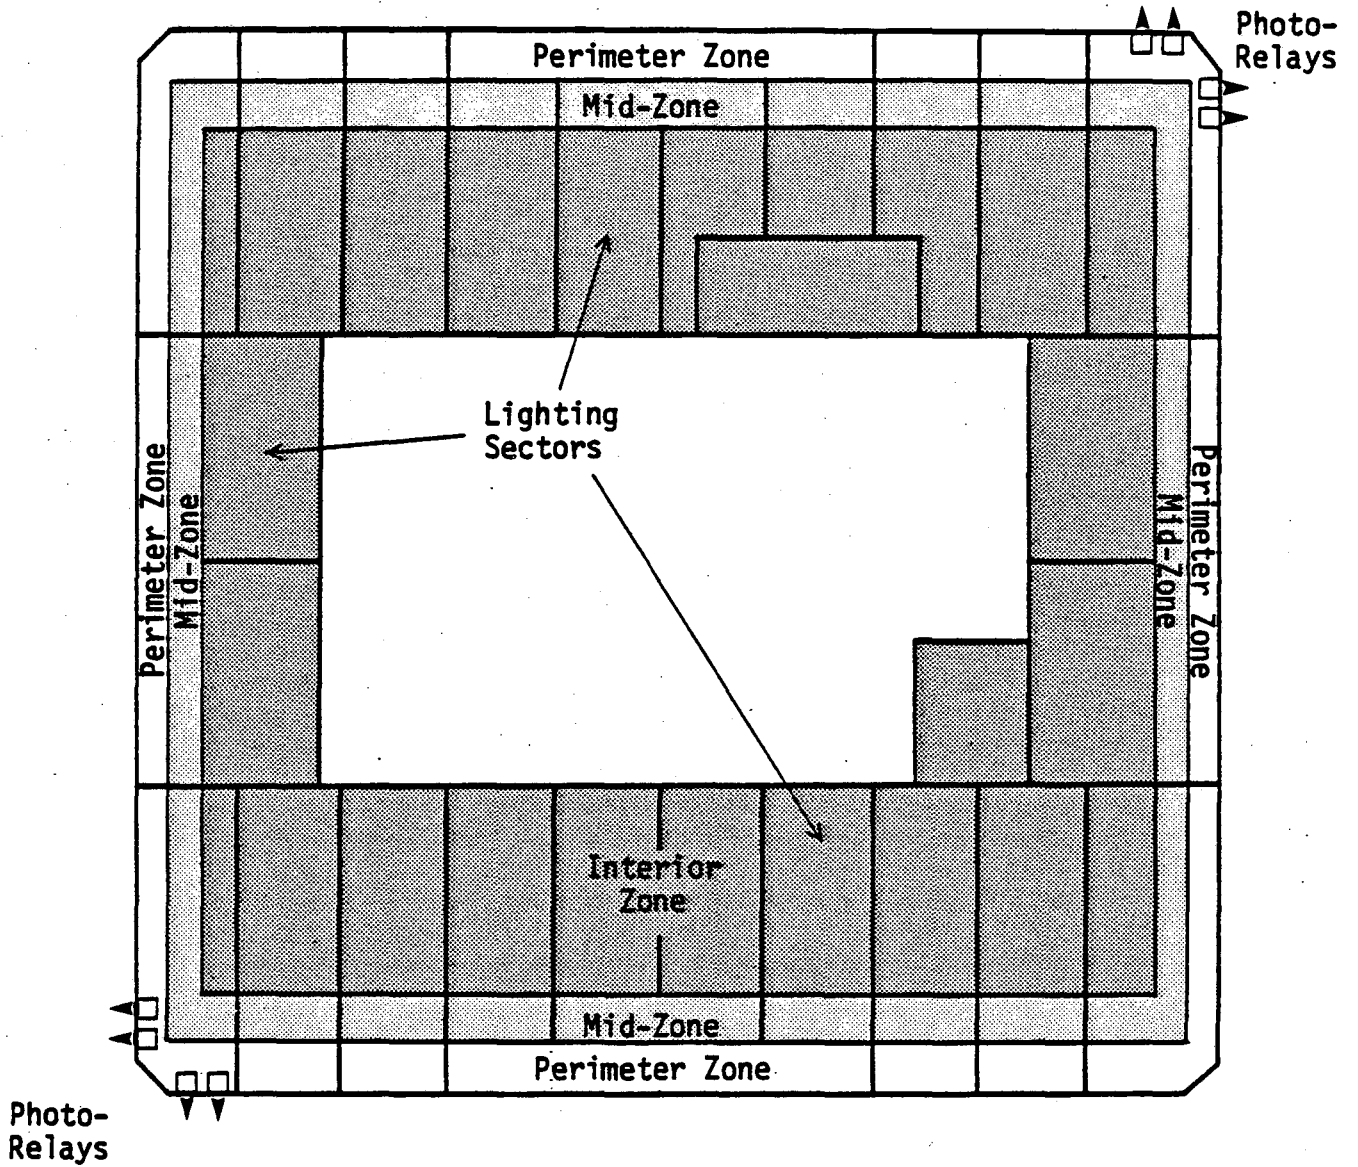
Plan View of 58th Floor of World Trade Center Showing Lighting Sectors and Daylit Zones.
